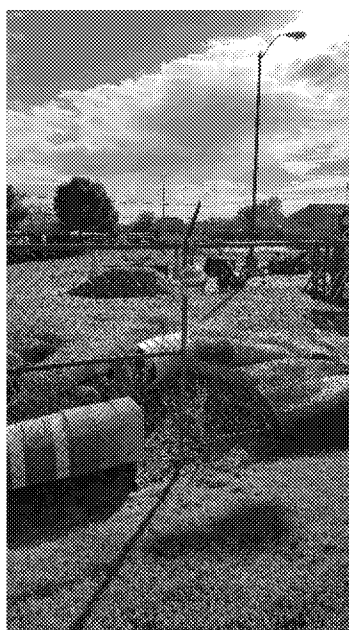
Site #3, looking towards Terumo BCT sterilization facility
